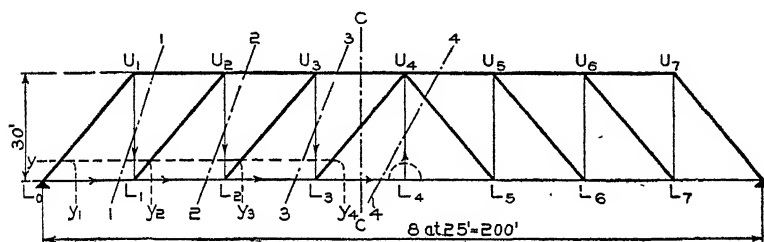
Outline Diagram of 8-Panel Single-Track Howe Truss Span
